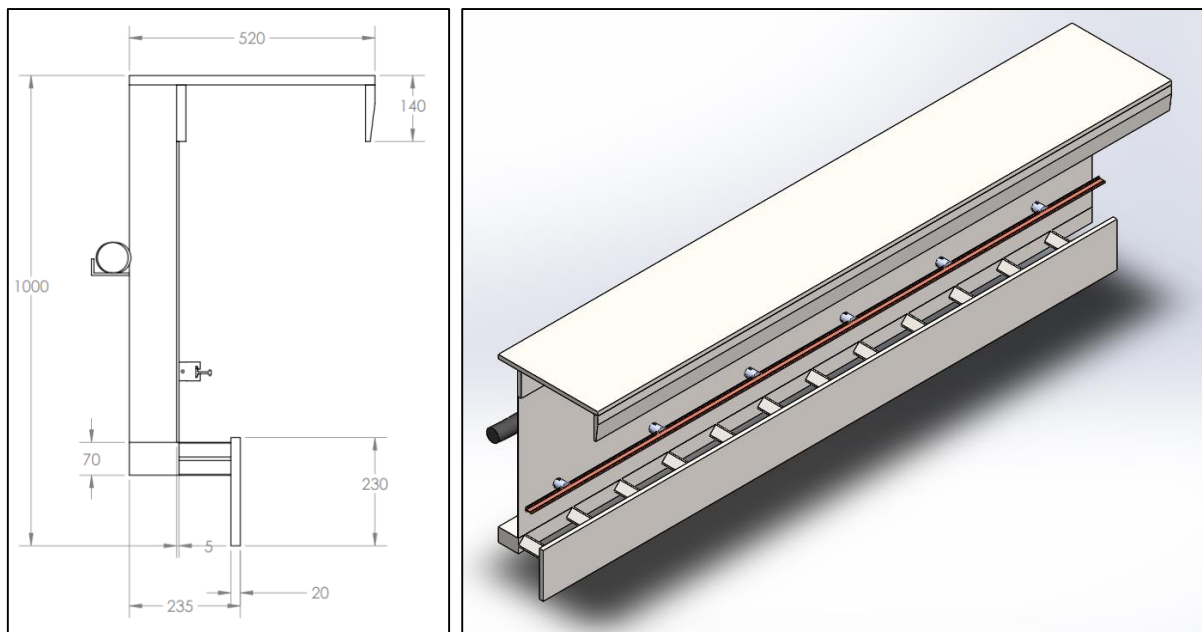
Spartan Superway Rail cross-section as suggested by Beamways AB
